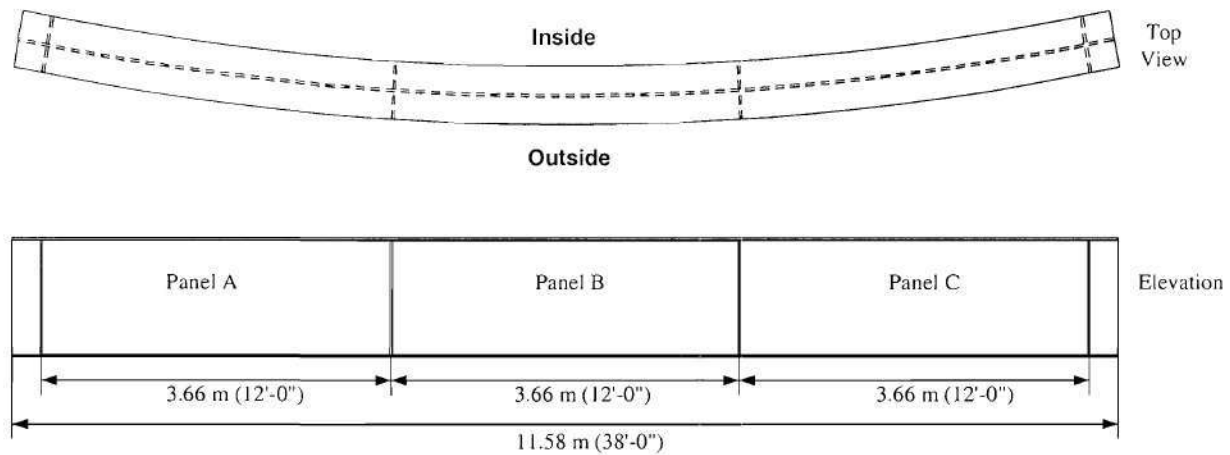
Geometry and longitudinal dimensions of test girders S1 and S2
